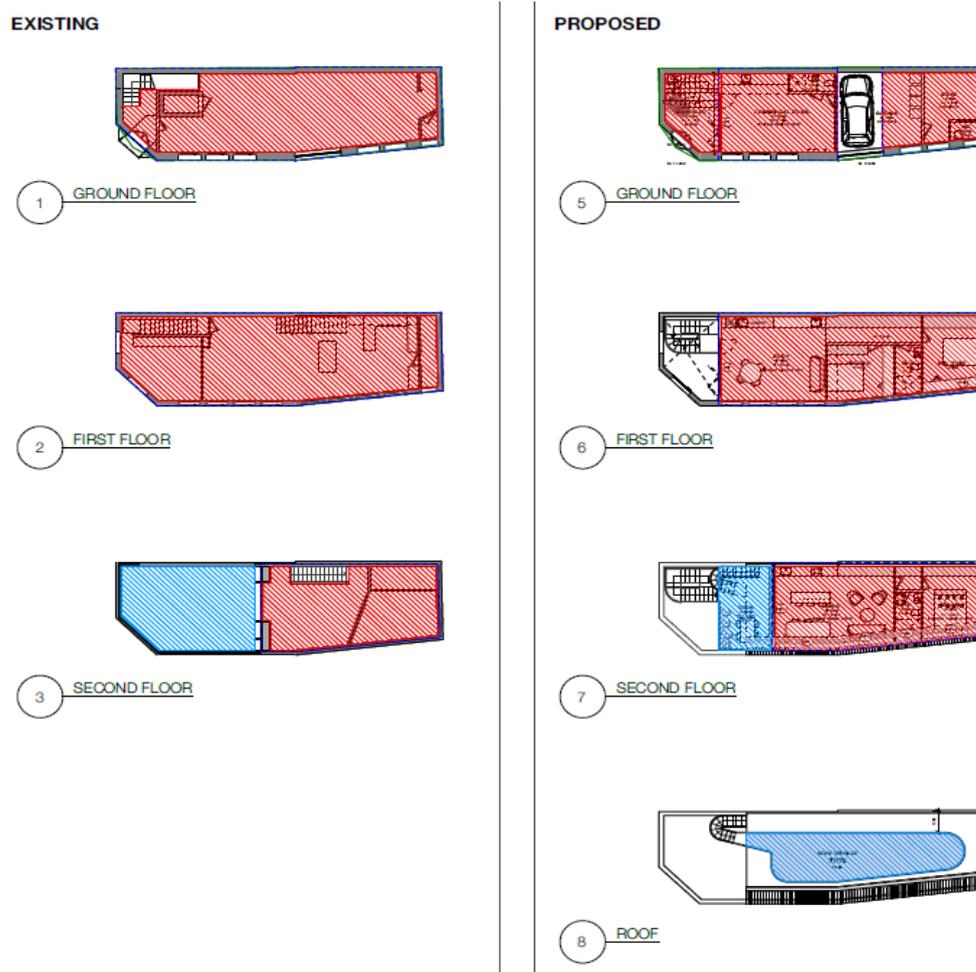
The applicant's FSR calculations showing existing FSR (left) and proposed FSR (right). FSR is shown in red and private open space in blue.
